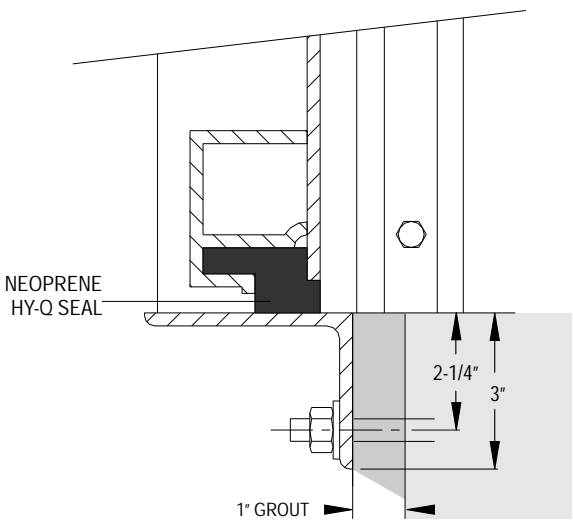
761- Aluminum End-of-Channel Mounting with HY-Q Seal; Section BB
